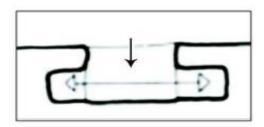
Schematic cross-section and plan of a vertical dwelling [14]
